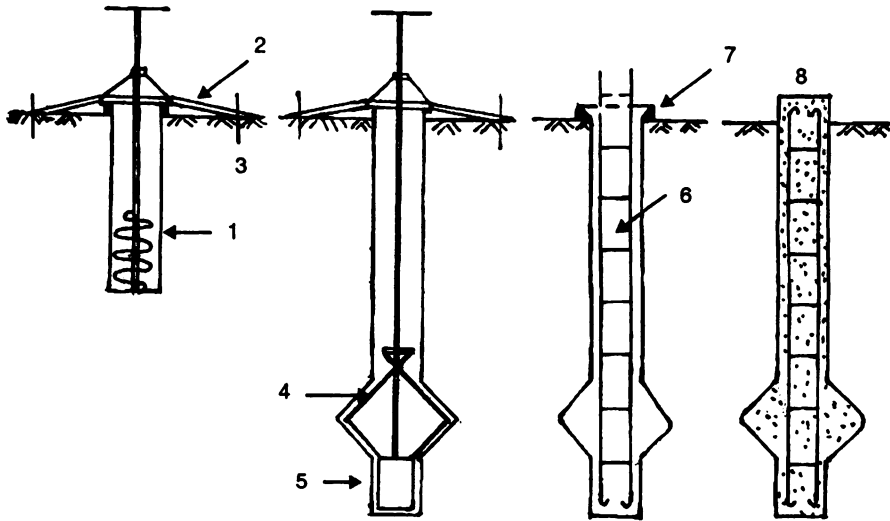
Stages in construction of underreamed piles: 1. Spiral auger for making the hole of required diameter, 2. Boring guide for aligning the centre of pile, 3. Spikes for anchoring boring guide, 4. Underreaming tool, 5. Bucket to receive soil removed during underreaming, 6. Pile reinforcement, 7. Steel funnel laid above hole for pouring concrete in the hole, 8. Completed underreamed pile.
